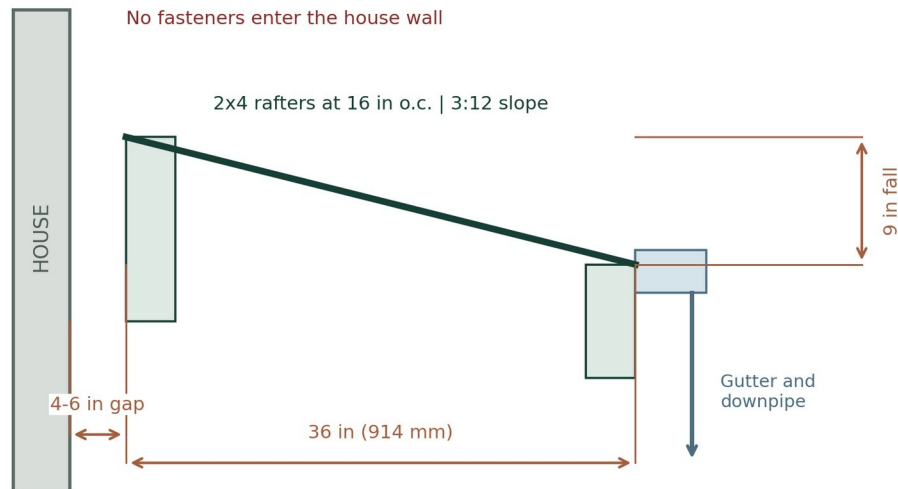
The high side stands clear of the building and the low gutter takes all roof water.
